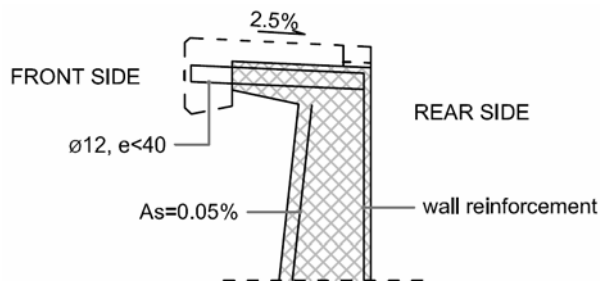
Detail of crown of concrete gravity supporting wall
